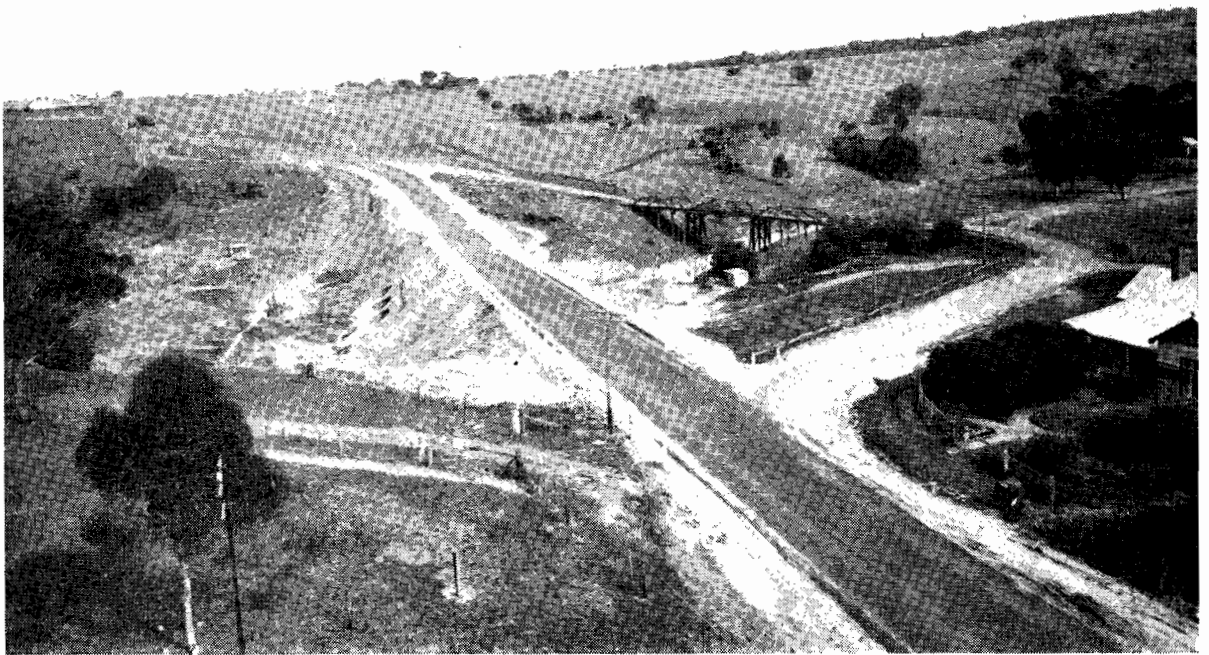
Shire of Bacchus Marsh—Balliang Road, Parrwan Creek culverts.
